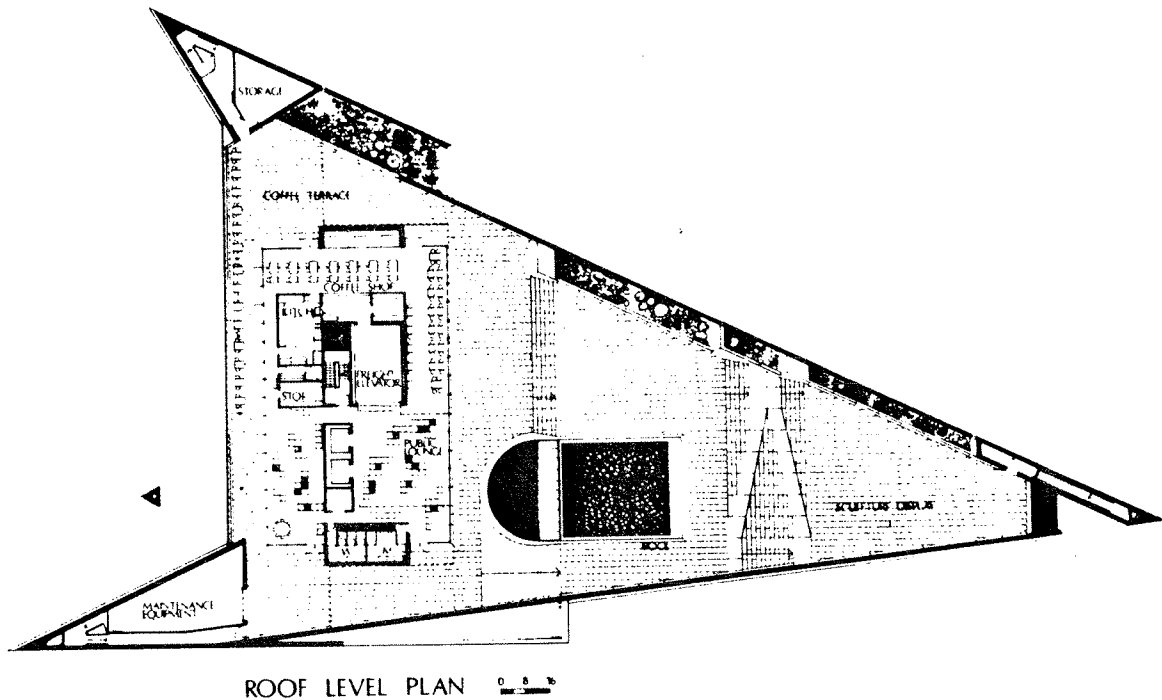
Plan of Winnipeg Art Gallery Roof Garden (From Lee, 1982.)
